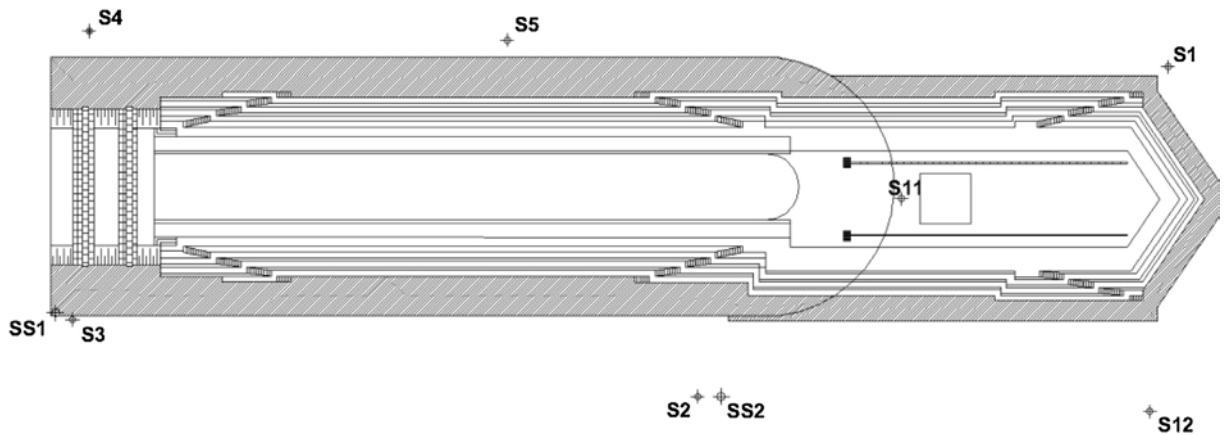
Dry Dock plan with the SPT drillings points (S: 2005 tests, SS: 2009 tests).
